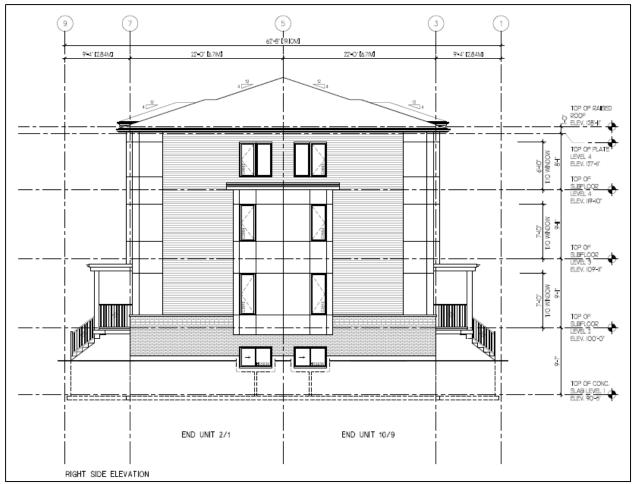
Right Side Elevation Block A - 279 Sarnia Road.
